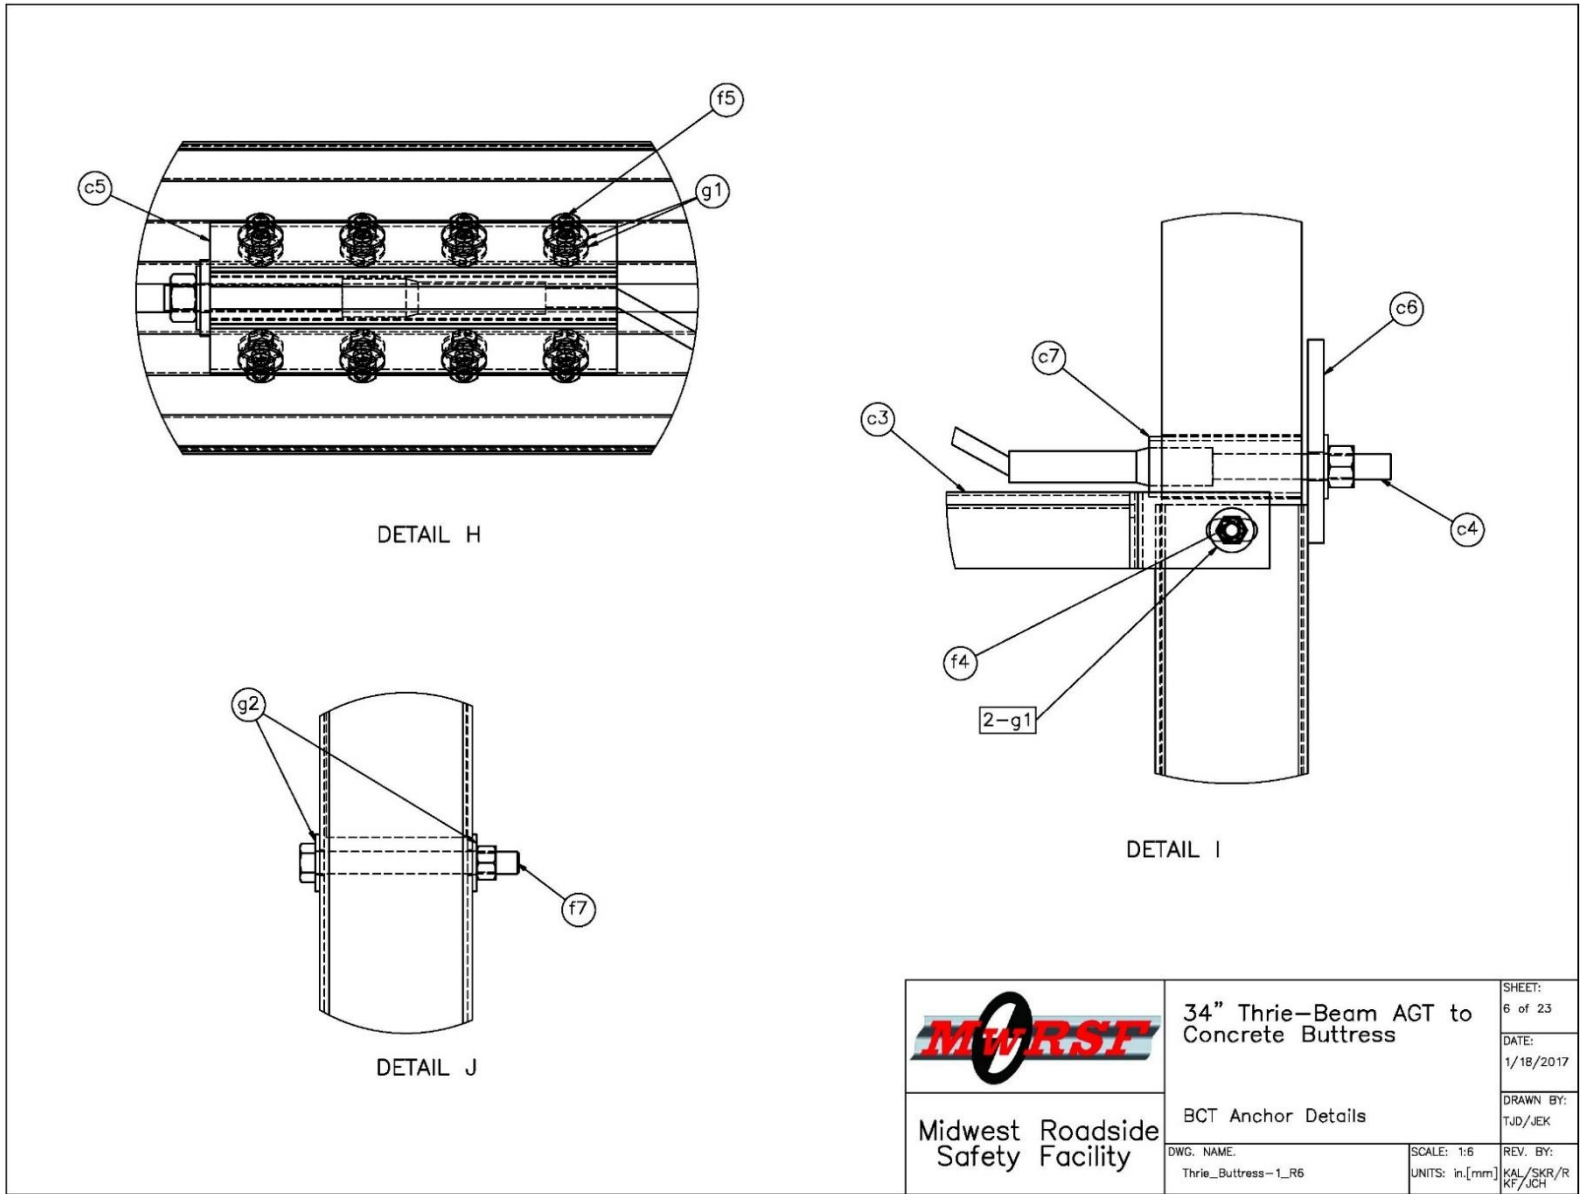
BCT Anchor Details, Test Nos. 34AGT-1 and 34AGT-2
